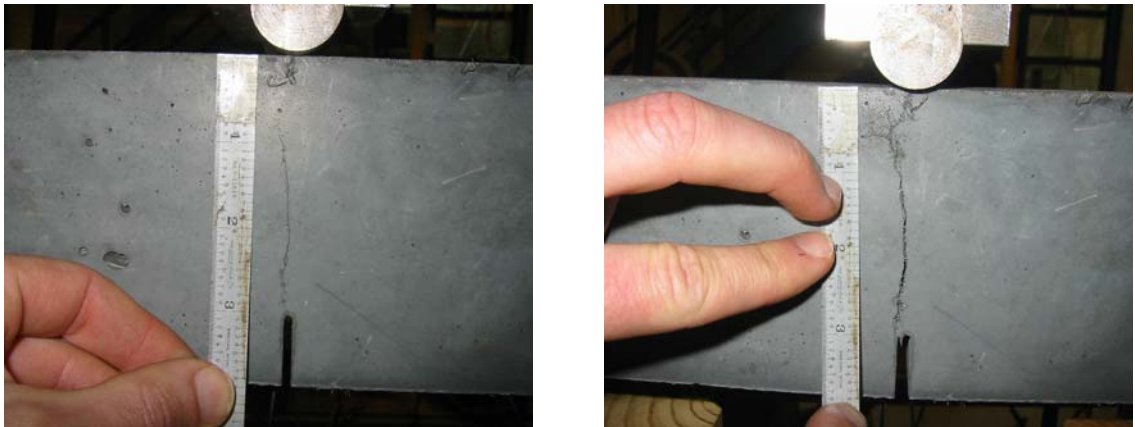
C: Prism M1P00 after (a) 3.4 in. and (b) 3.85 in. of crack extension
